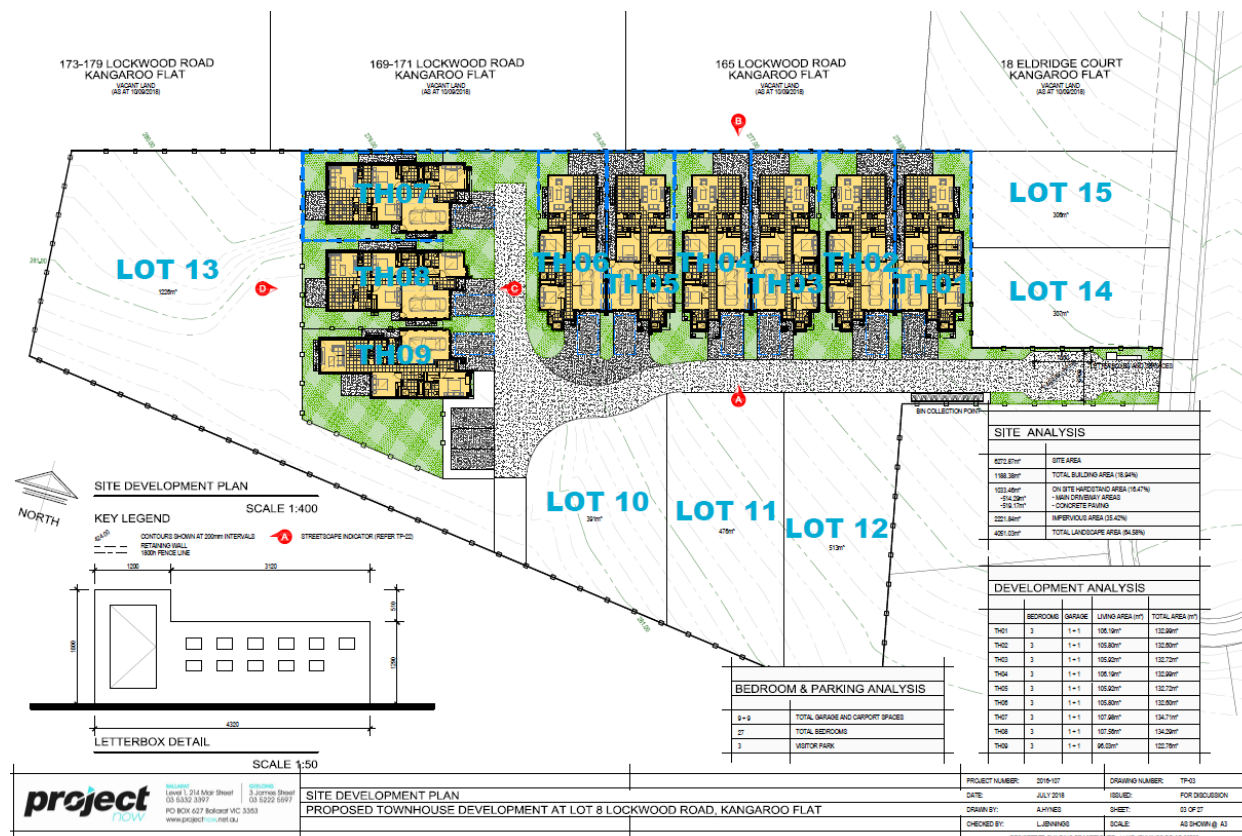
Site layout (18 lots/dwellings) as proposed under DR/775/2016 (since withdrawn).
